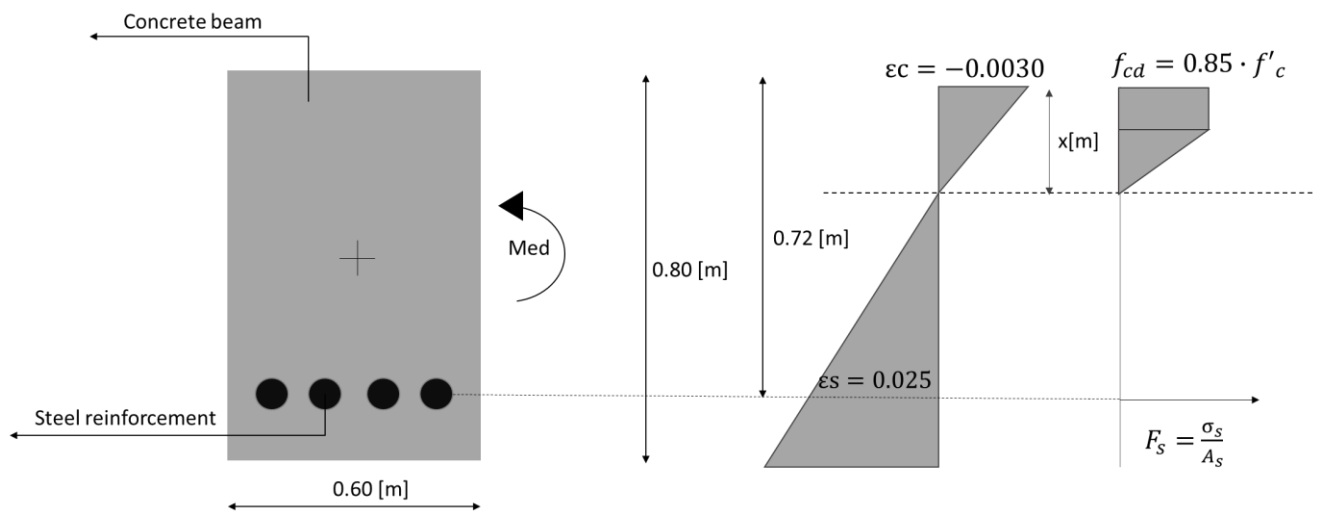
Cross section and stress- strain distribution adapted from ACI considering failure due to concrete crushing [7]
